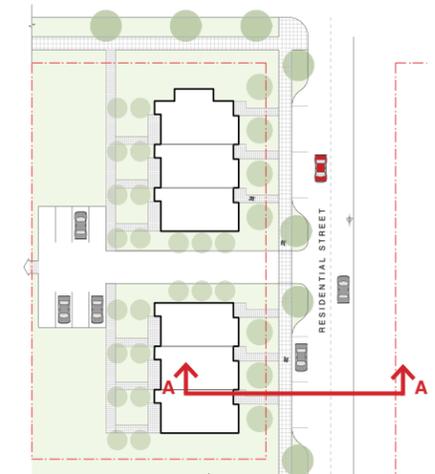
SAMPLE SITE PLAN (not to scale)
